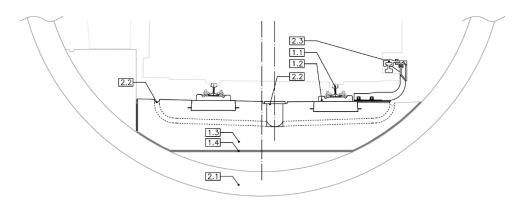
Components of ballastless track system in a tunnel on example of the Warsaw Metro line II. Key: 1.1 – Vignole rail profile type 49E1; 1.2 – rail fastening system – Embedded Blocks System (EBS); 1.3 – concrete track slab; 1.4 – slab-track mat; 2.1 – concrete inverted slab; 2.2 – surface drainage; 2.3 – conductor-rail.
